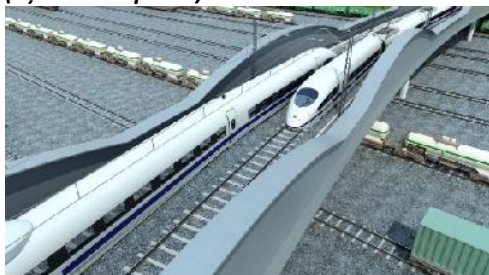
Cross-cut of the cross-over construction over the existing 1 520 mm railway track in Riga (Šķīrotavas parks)
